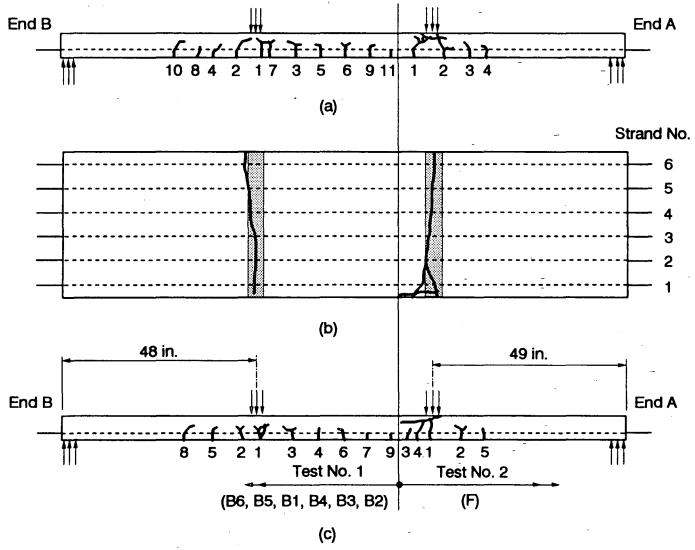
Crack patterns for D-type Specimen No. 16-6.0DU-1: (a) mirrored side view along Strand No. 6; (b) top view; (c) side view along Strand No. 1
